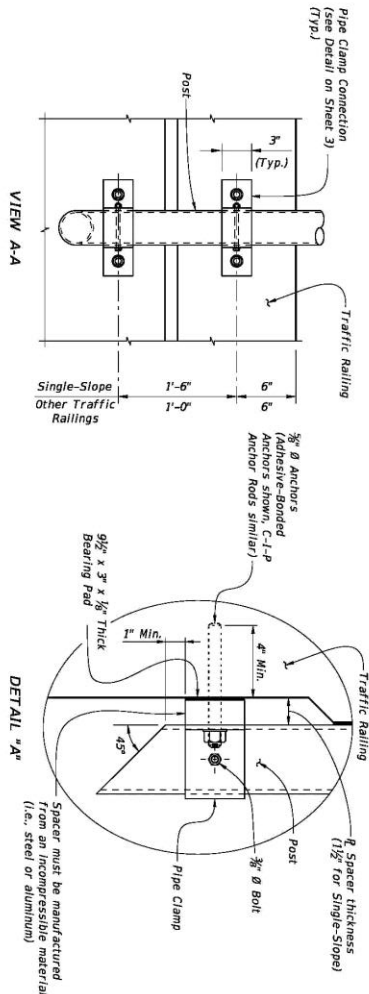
Florida Bridge Fencing Over Railroad, Sheet 1 [4]
